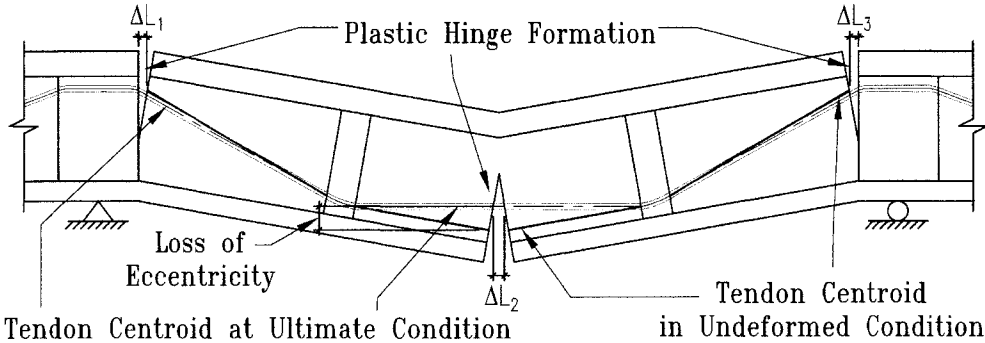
Continuous Beam with Internal Unbonded Prestressing
